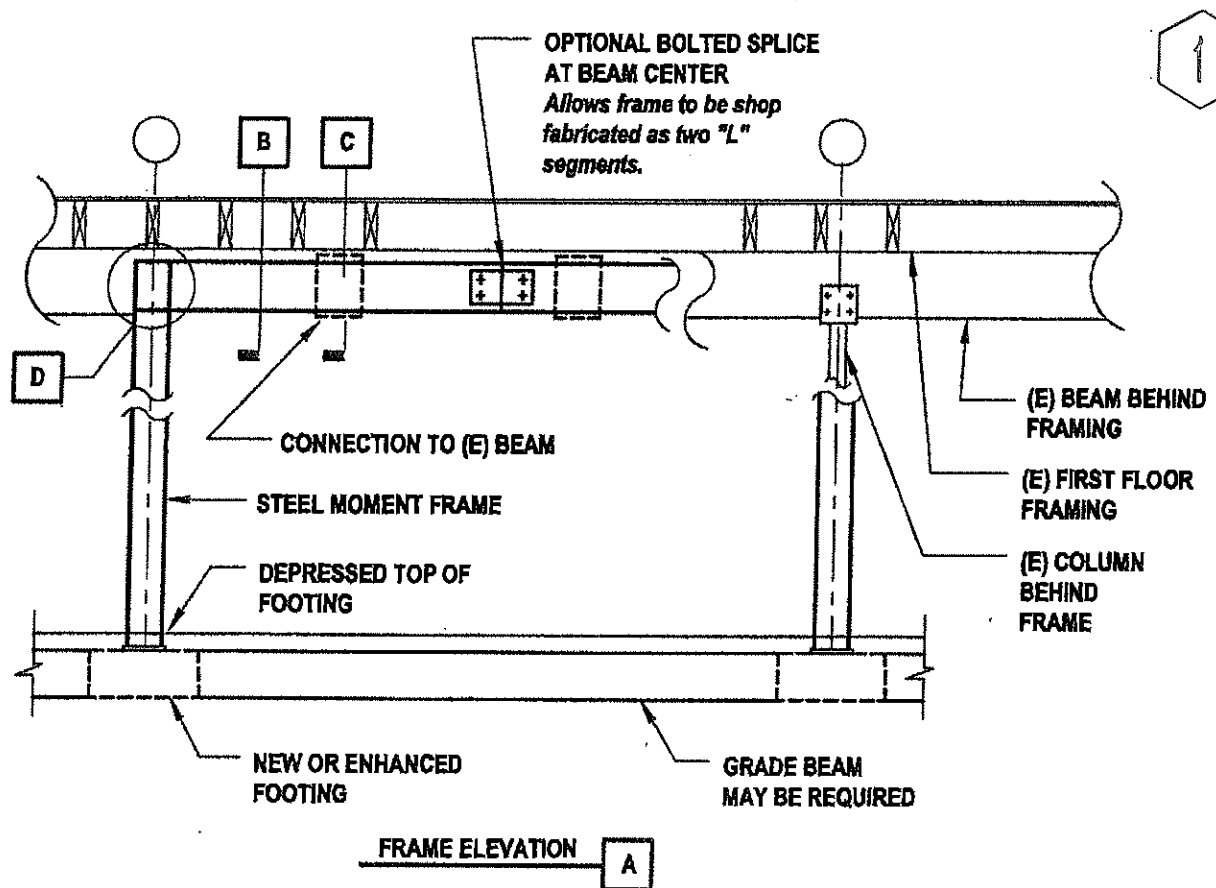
A: Elevation of Steel Moment Frame in W1A Building
